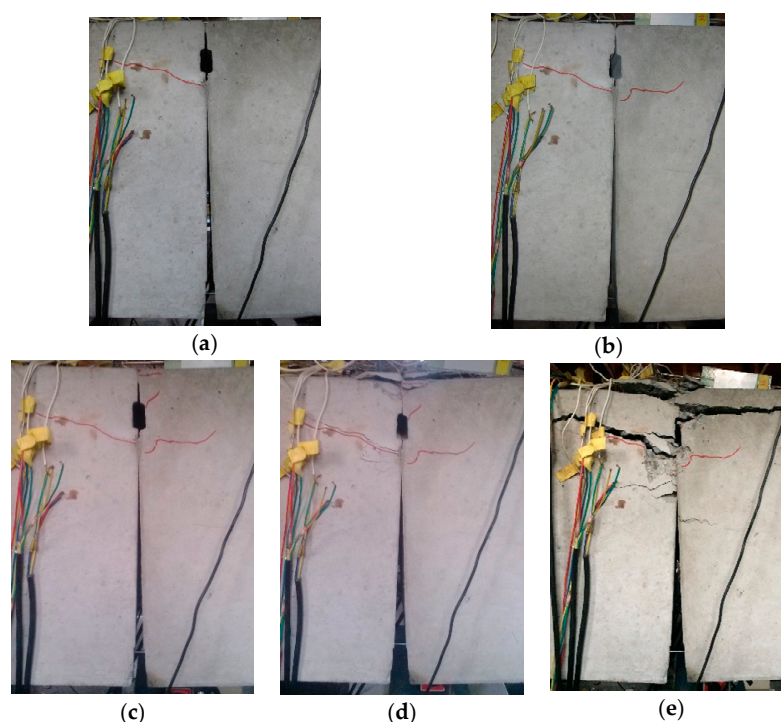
Type-A joint under a positive bending moment: (a) core section cracking; (b) outer edge contacting; (c) outer section cracking; (d) crack penetration; (e) concrete crushing.
